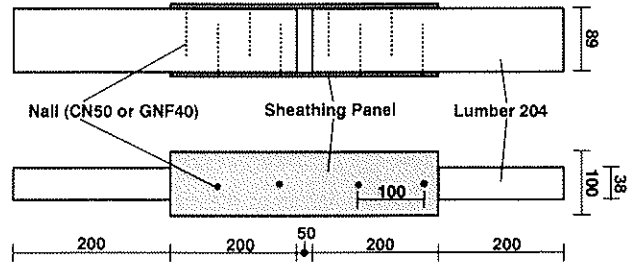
Test specimens for the reverse-cyclic test of nail joints.
